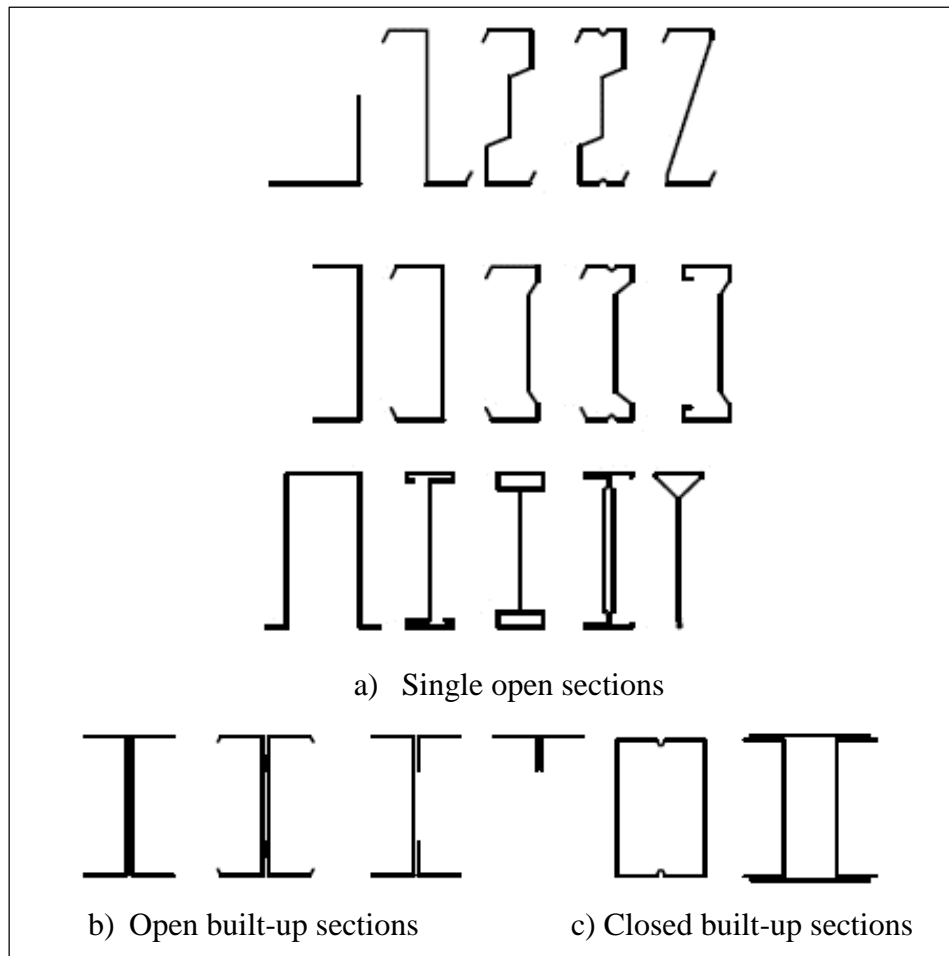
Cold-formed steel section (Dubina et al., 2012)
